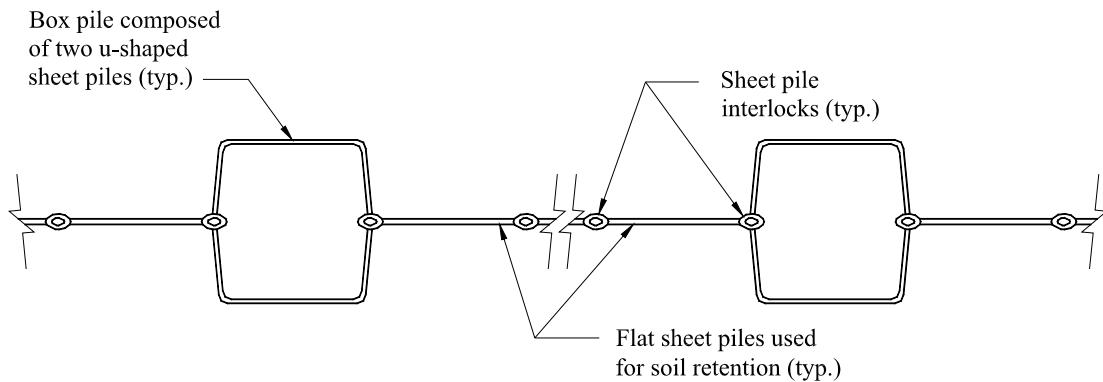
Plan view of a combination box and flat sheet pile abutment below the pile cap.
